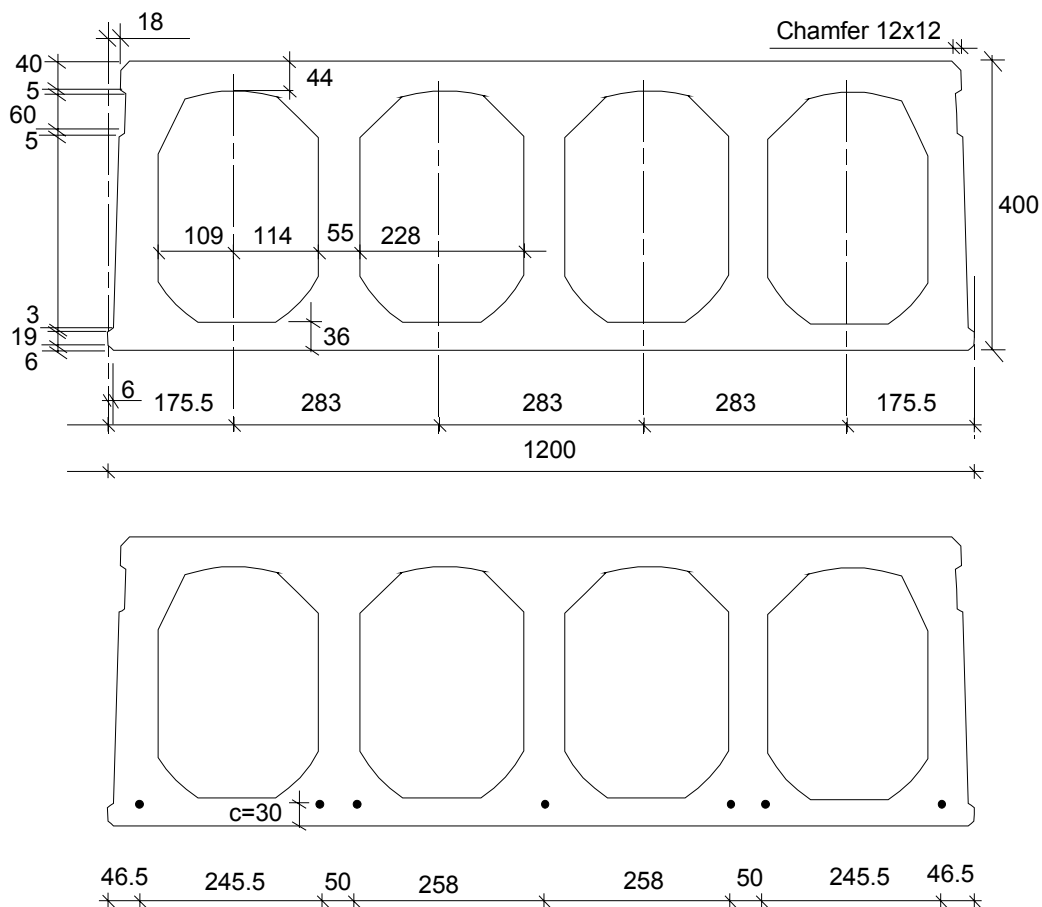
Nominal cross-section and location of strands in test specimens PT400A and PT400B. c refers to concrete cover below the strand.
